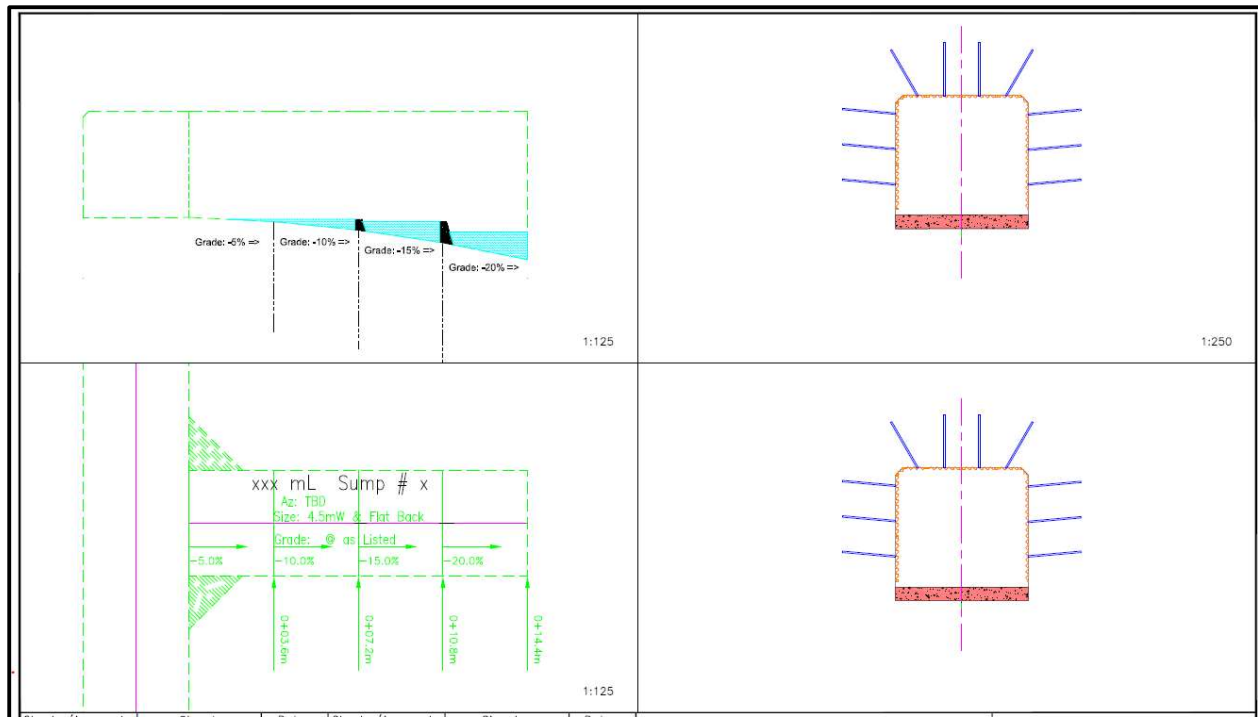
Underground Sump Details (Clean and Dirty Water Sumps)
